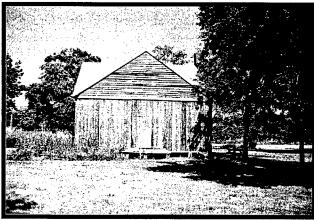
An overview of the rear (eastern) elevation of Standing Structure 55-1113. Note the cross gable, the horizontally oriented planks along the exterior wall, the vertically oriented planks along the gable, the back door, the back porch, and the supporting piers.
